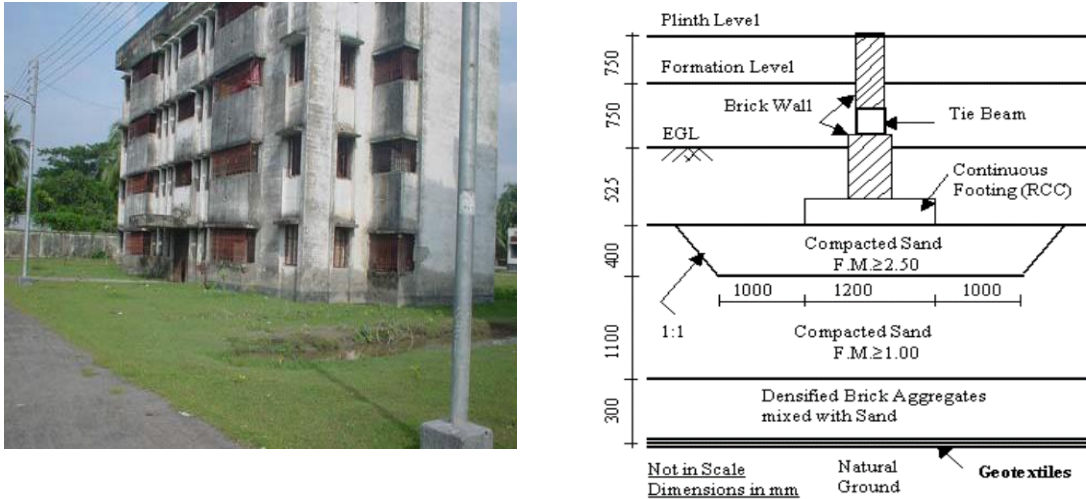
Residential Building of Khulna Medical College and its Foundation system (Hossain et al., 1999)
